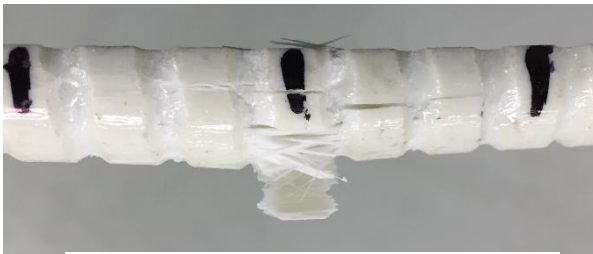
Close-up View of Side Face of M8 Specimen Subjected to 4-Point Bending
